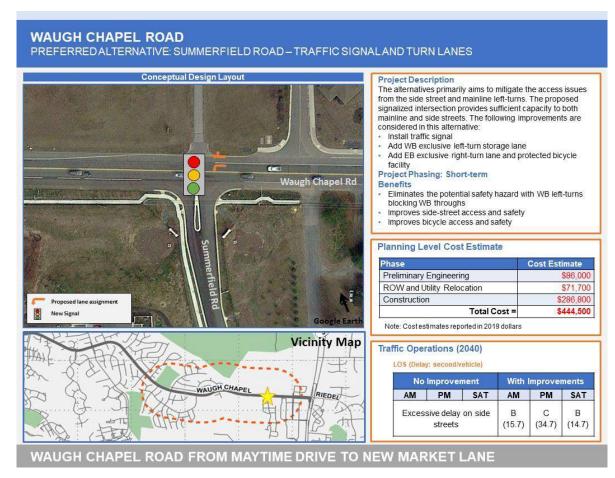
Project Summery for the Preferred Alternative at Summerfield Road/Waugh Chapel Road Intersection
